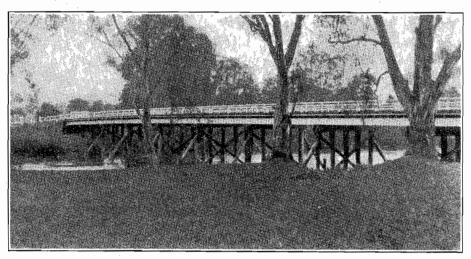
Showing reconditioned bridge over the Goulburn River at Seymour.
